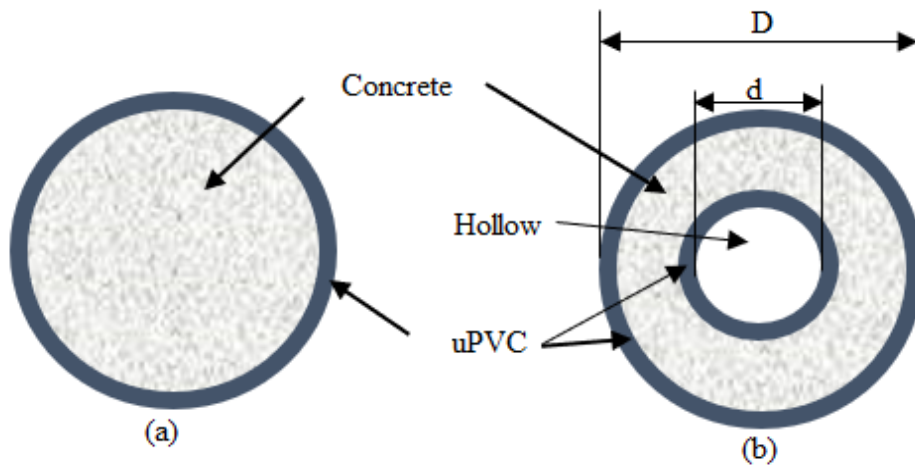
(a) Single Layer (b) Double Layer (double skin).
